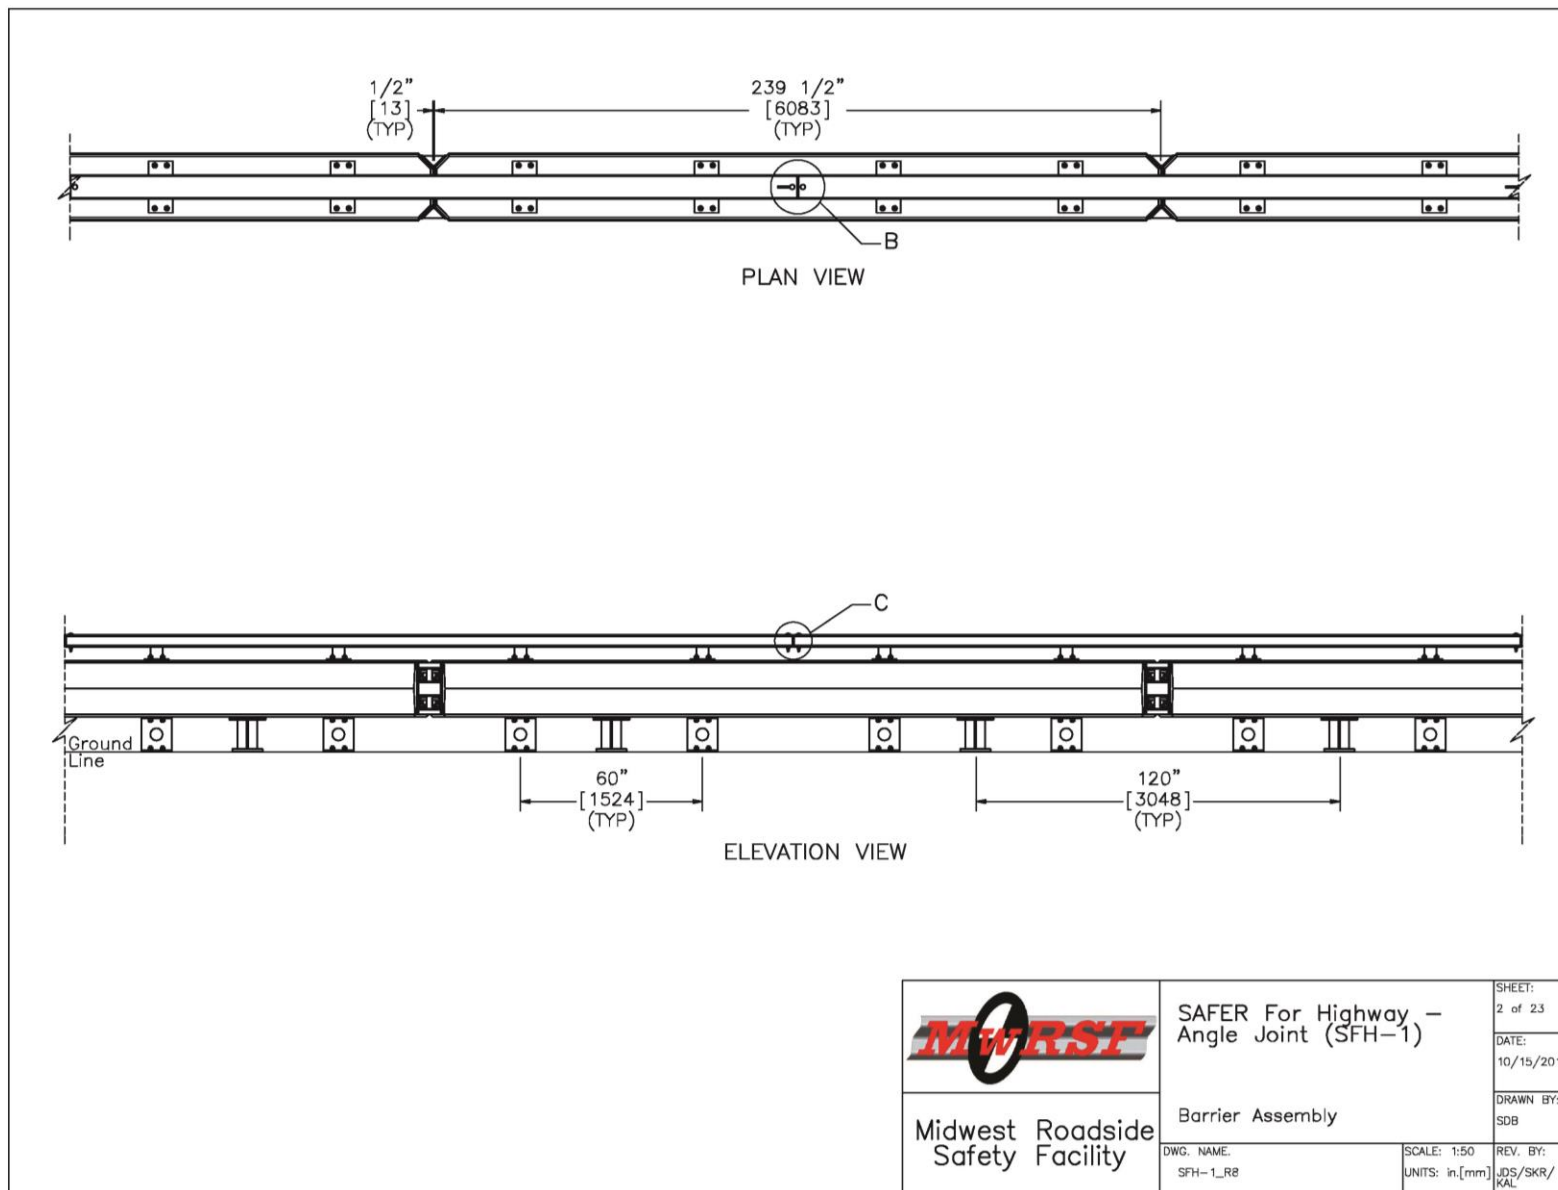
Recommended Barrier Design for Full-Scale Crash Testing, Barrier Assembly
